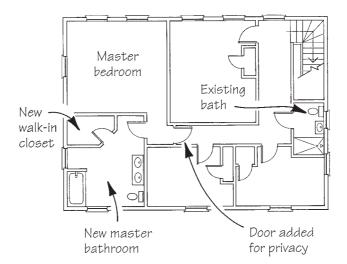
The existing bath was a long way from the master bedroom. Using a bedroom for the new bath creates a private master suite at the end of the hall.
